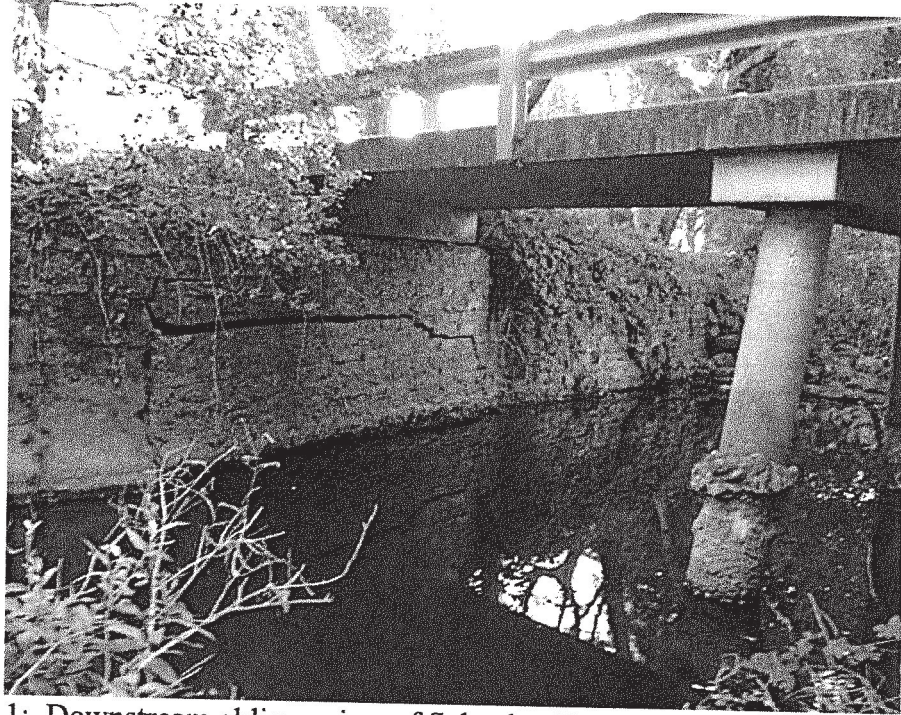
Downstream oblique view of Salvador Channel at the existing bridge crossing and the severely cracked east abutment. Note the remnant ring of grouted rock on the bridge pier, approximately two feet above the ponded water level.
